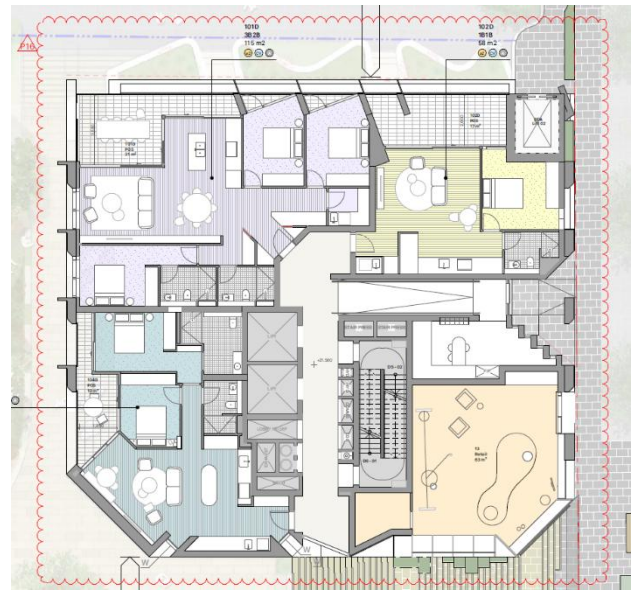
Rts Proposed Façade and Apartment Layout (Level 03)
